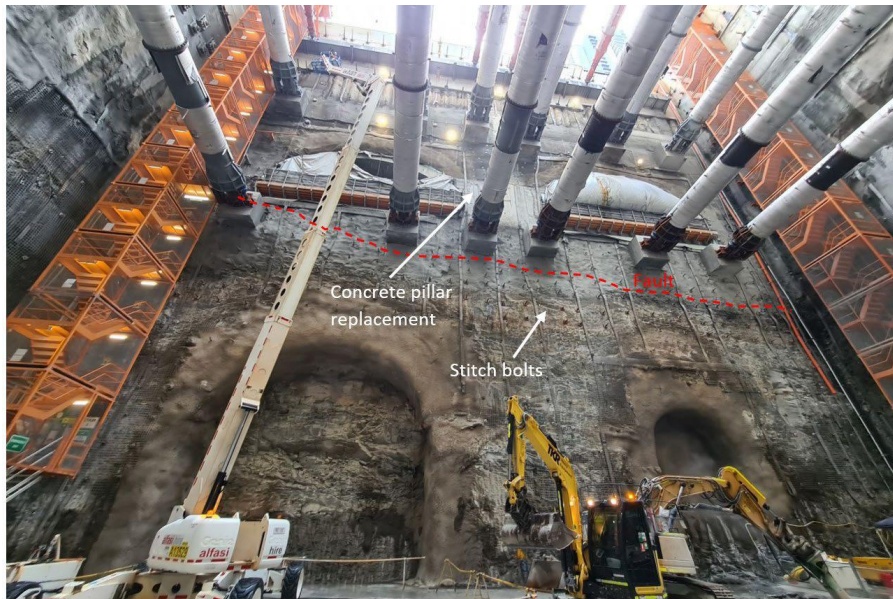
Albert Street Station Lot 1 shaft showing cavern adits, temporary props, stitching bolts, concrete pillar replacement and approximate location of the low-angle fault.
